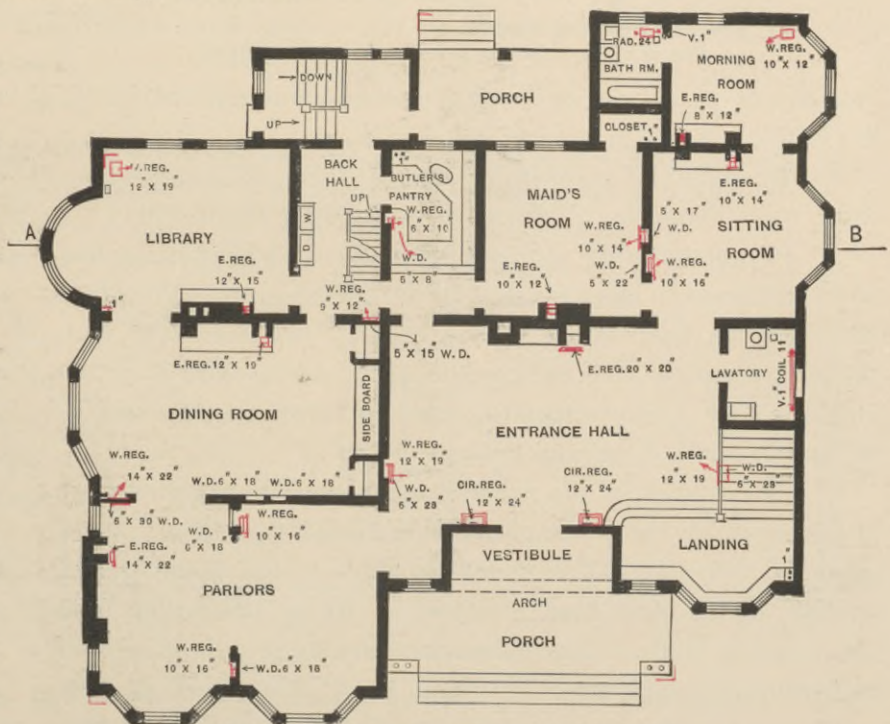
Plan of First Floor. Scale  $\frac{1}{8}$  inch to the foot.
